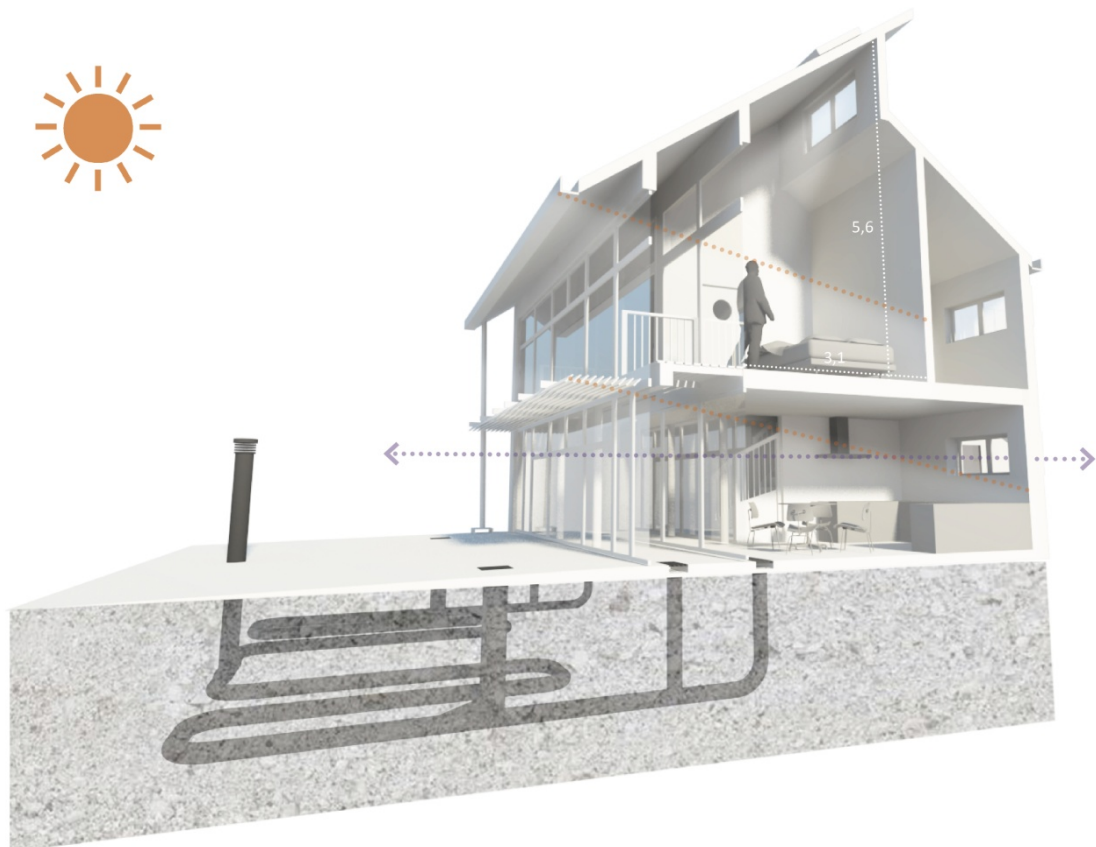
Scheme of the south-north section depicting the effect of amplification of the shallow section, and the reach of the sunlight on a winter day.
